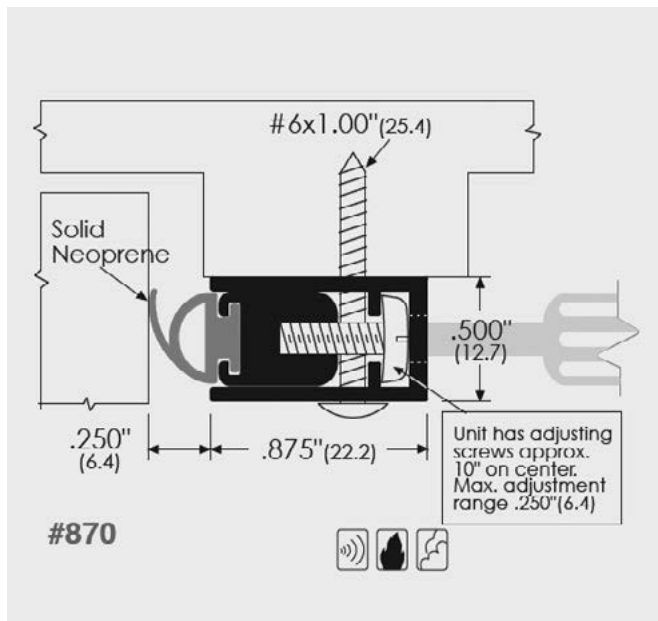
This jamb-applied adjustable sealing system features adjusting screws along its length, which can easily be tightened using a screwdriver to close any gaps in the gasketing.
